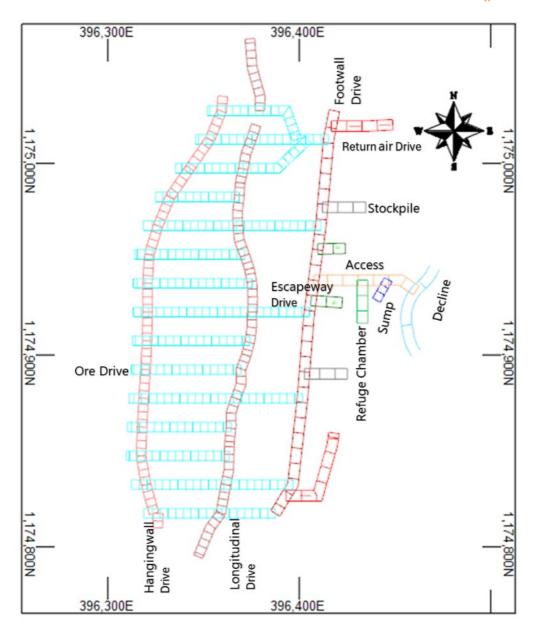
Typical Level Layout (9960 mRL) - Plan View
